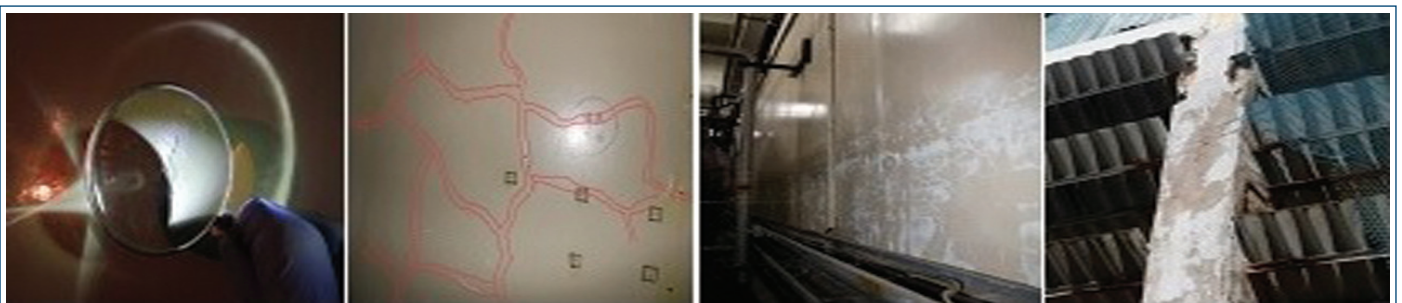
Visual Inspection Depicting Cracking, Leaching, Spallation
